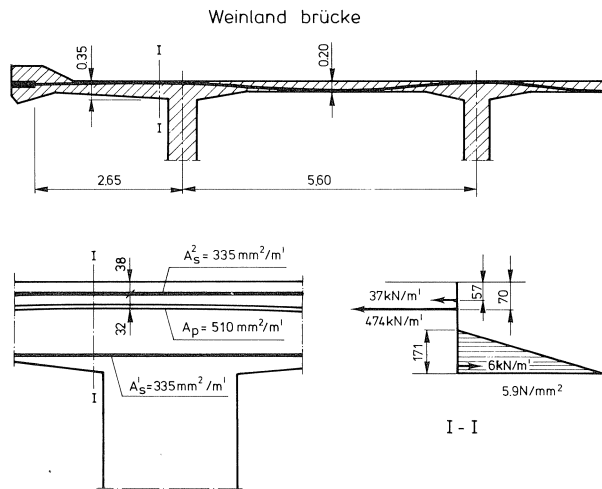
Weinland bridge, Switzerland. Reinforcement, prestressing and internal forces. (Reproduced from [43] pages 132, 133).
